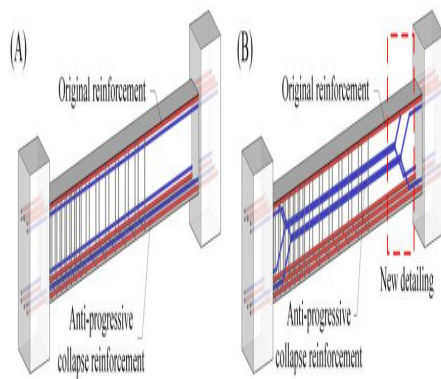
(A) Frame beam after progressive collapse design and (B) frame beam with new detailing [Color figure can be viewed at www.wileyonlinelibrary.com]
